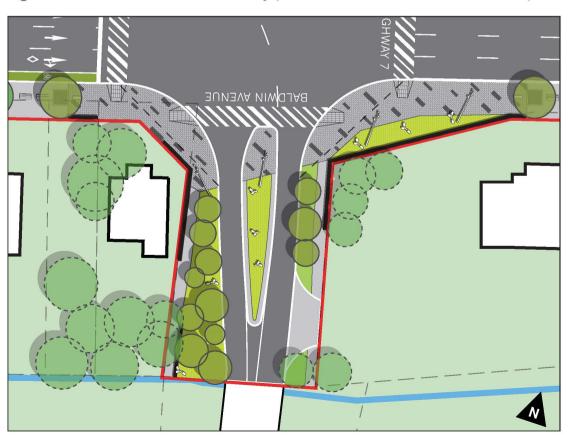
Baldwin Avenue Gateway (see Section 3.2.3.4 for enhanced detail).
